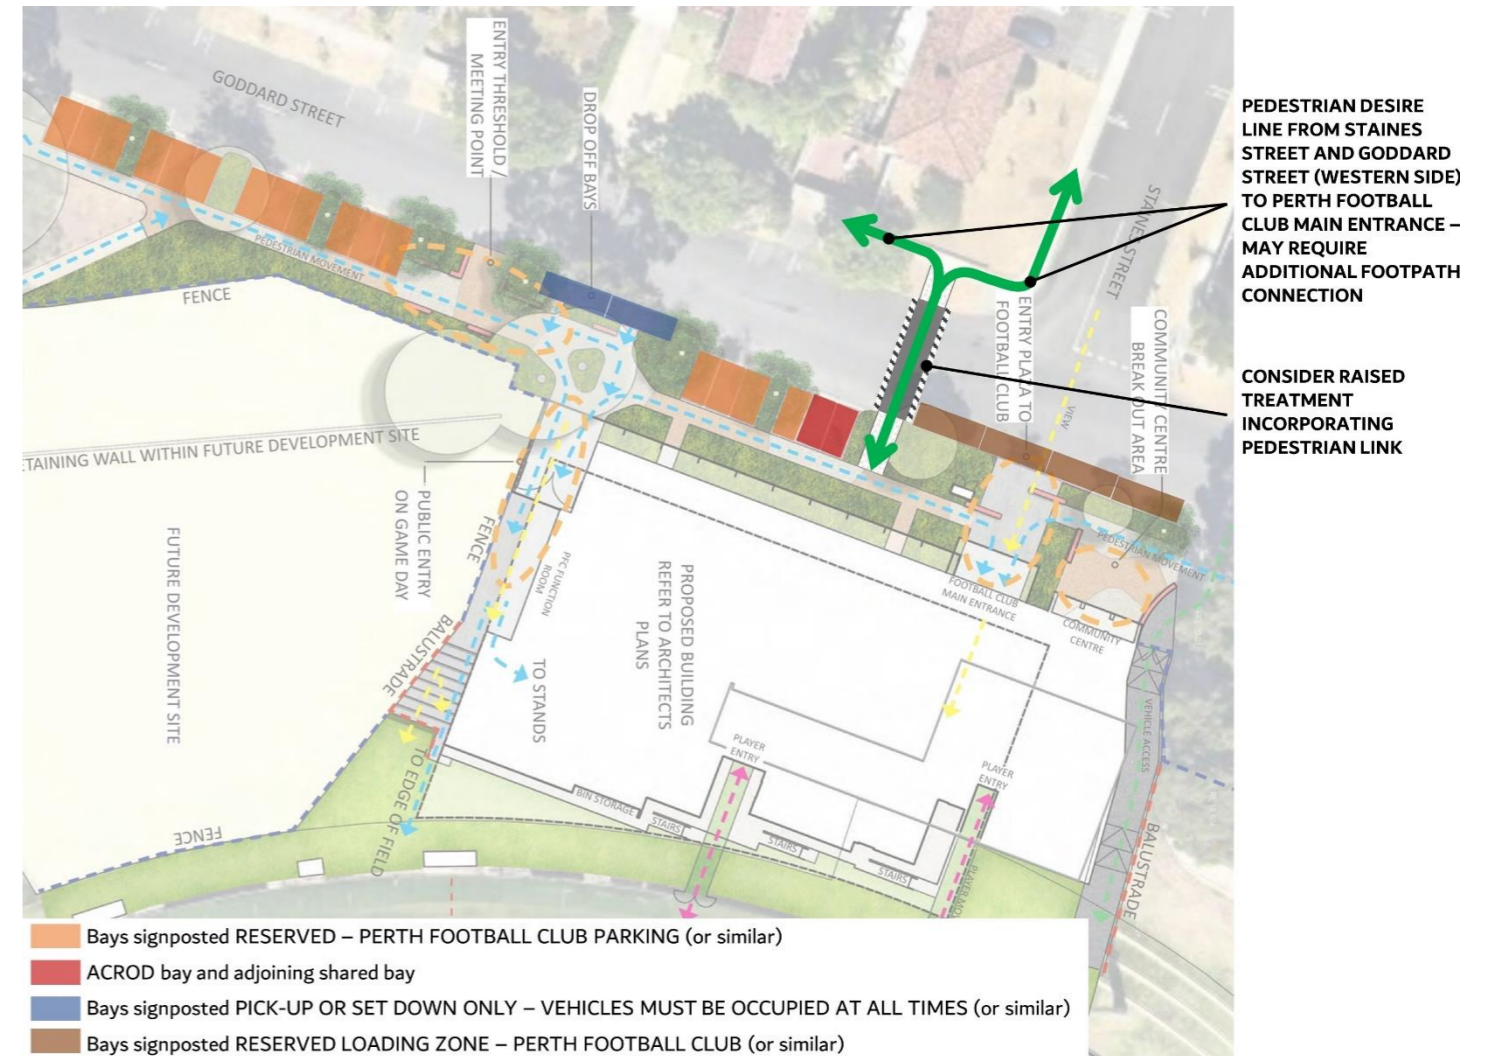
Possible additional pedestrian connection infrastructure (base plan source: Emerge Associates, Rev E dated 06/06/23)
